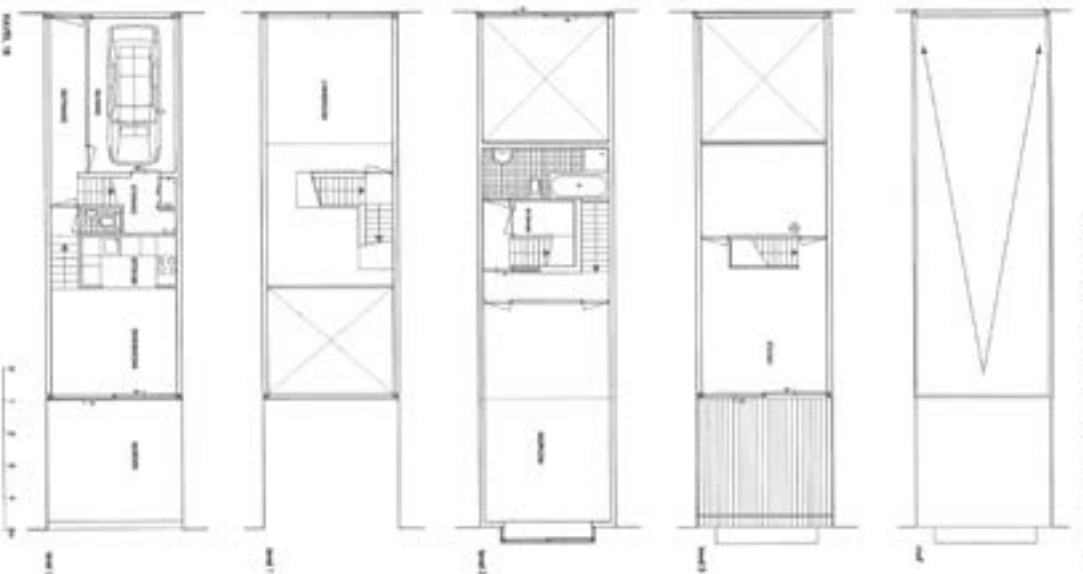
MVRDV, Borgo House Number 18, floor plan (reproduced by permission from MVRDV Architects).
